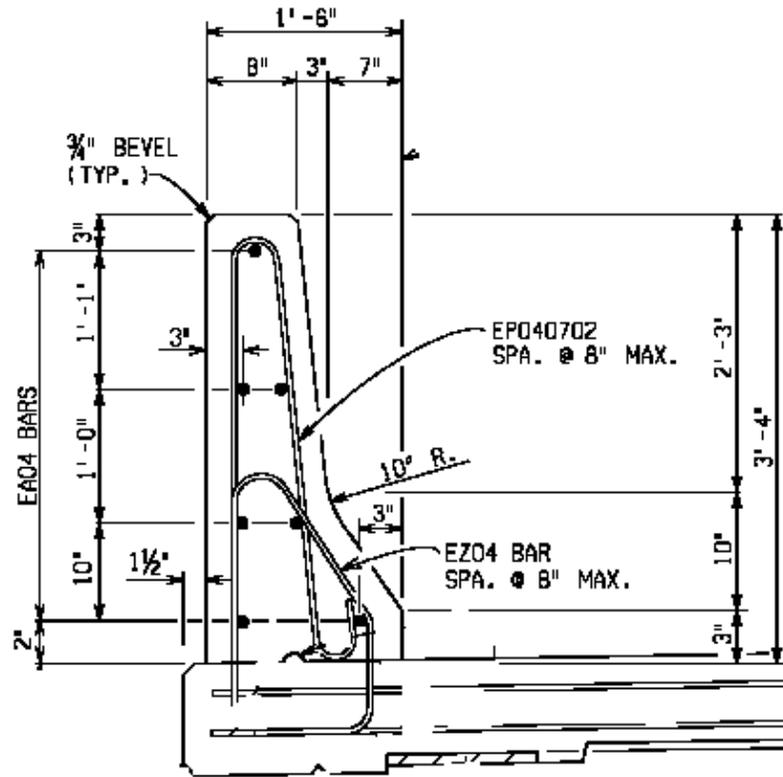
Cross-section of New Jersey Type 4 bridge barrier railing
